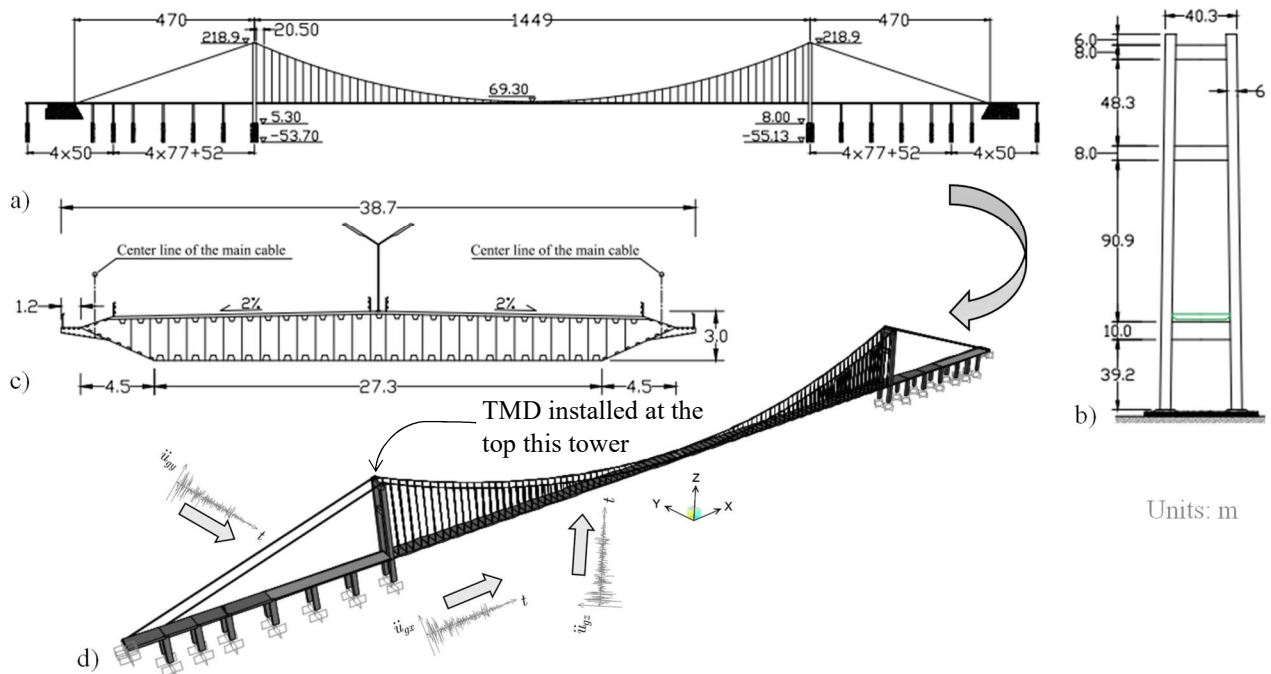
Geometrical data of the RSB: a) elevation view, b) suspension tower, c) deck cross section, d) finite element model.
